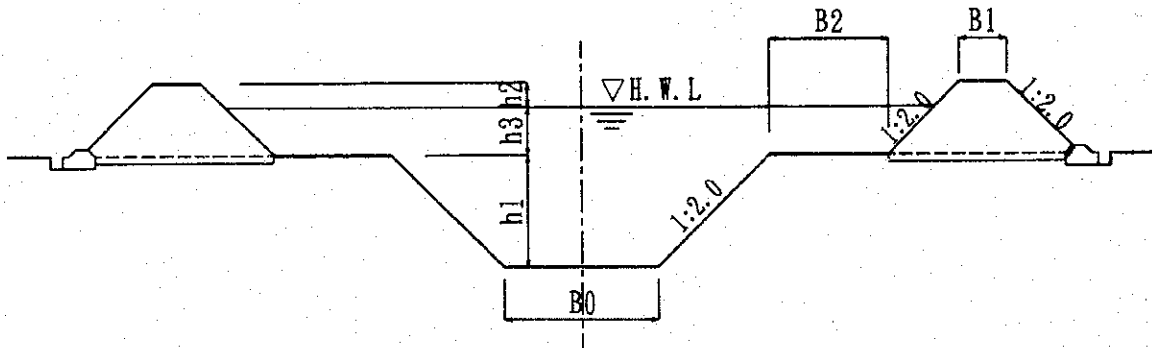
PROPOSED CROSS SECTIONS FOR
